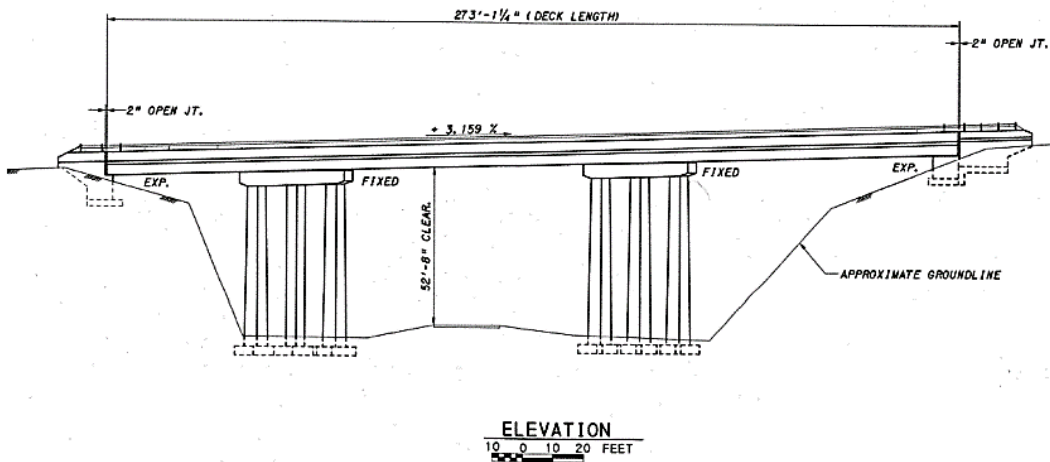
As-Built Plan (Elevation View) Bridge No. 22451
